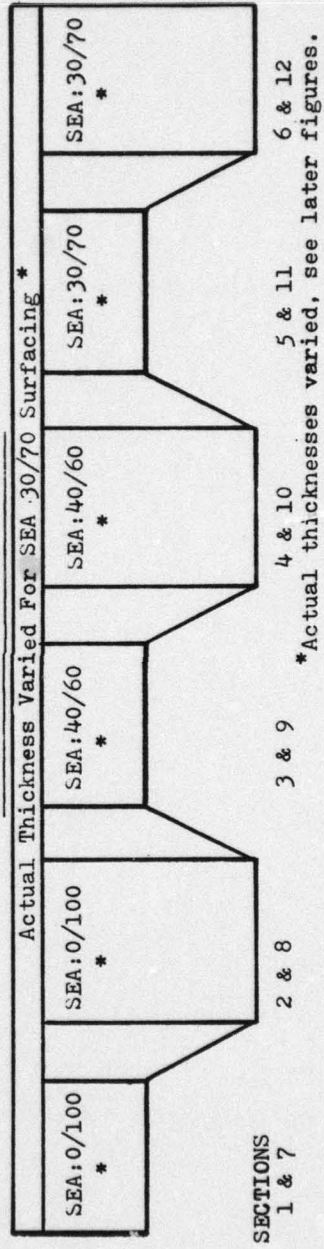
SCHEMATIC PROFILE OF TEST TRACK AS PLANNED COMPARED TO AS BUILT
